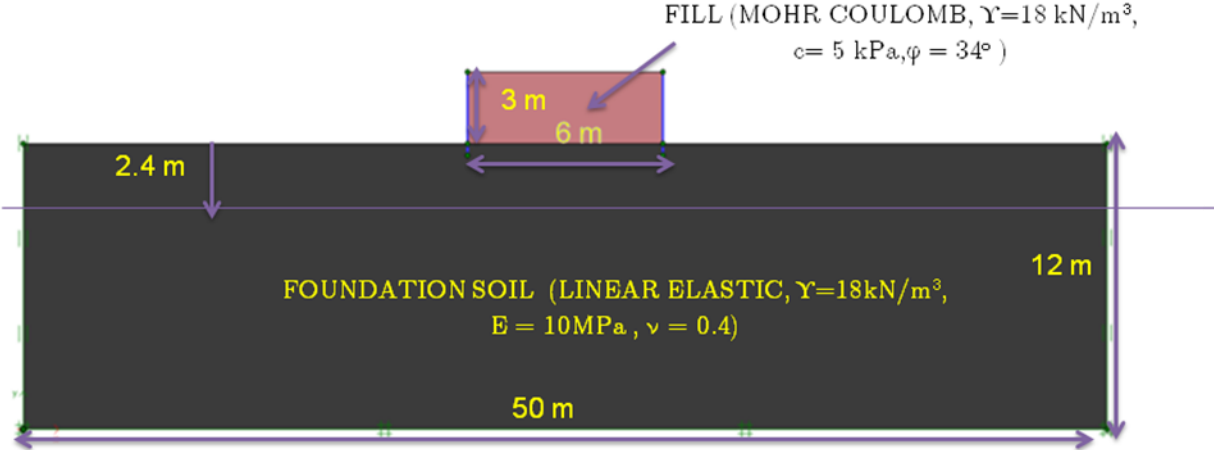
Plaxis model of Unreinforced Retaining Wall
